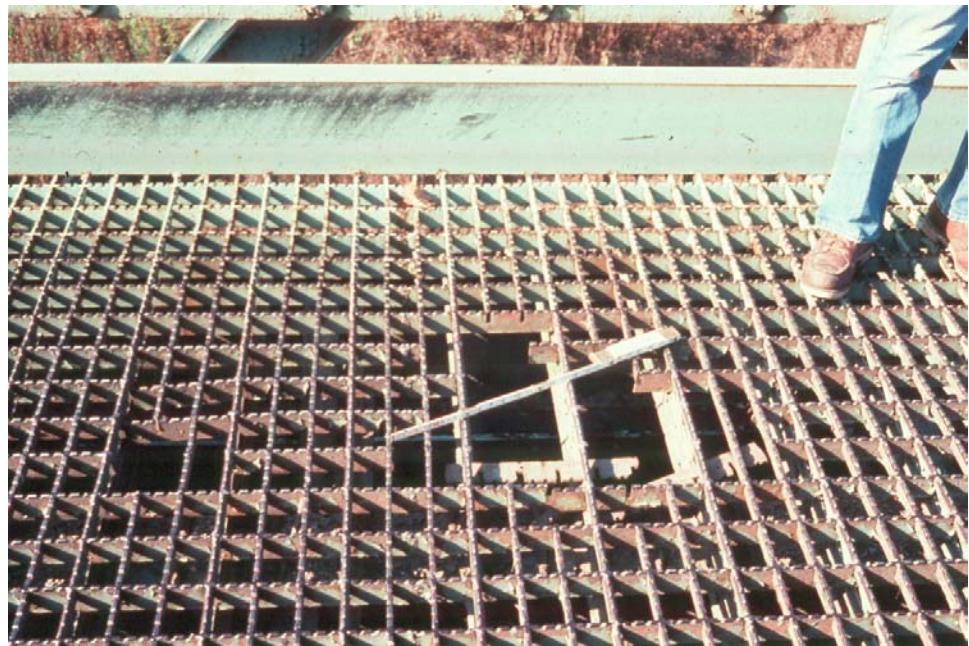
Broken Members of an Open Steel Grid Deck
